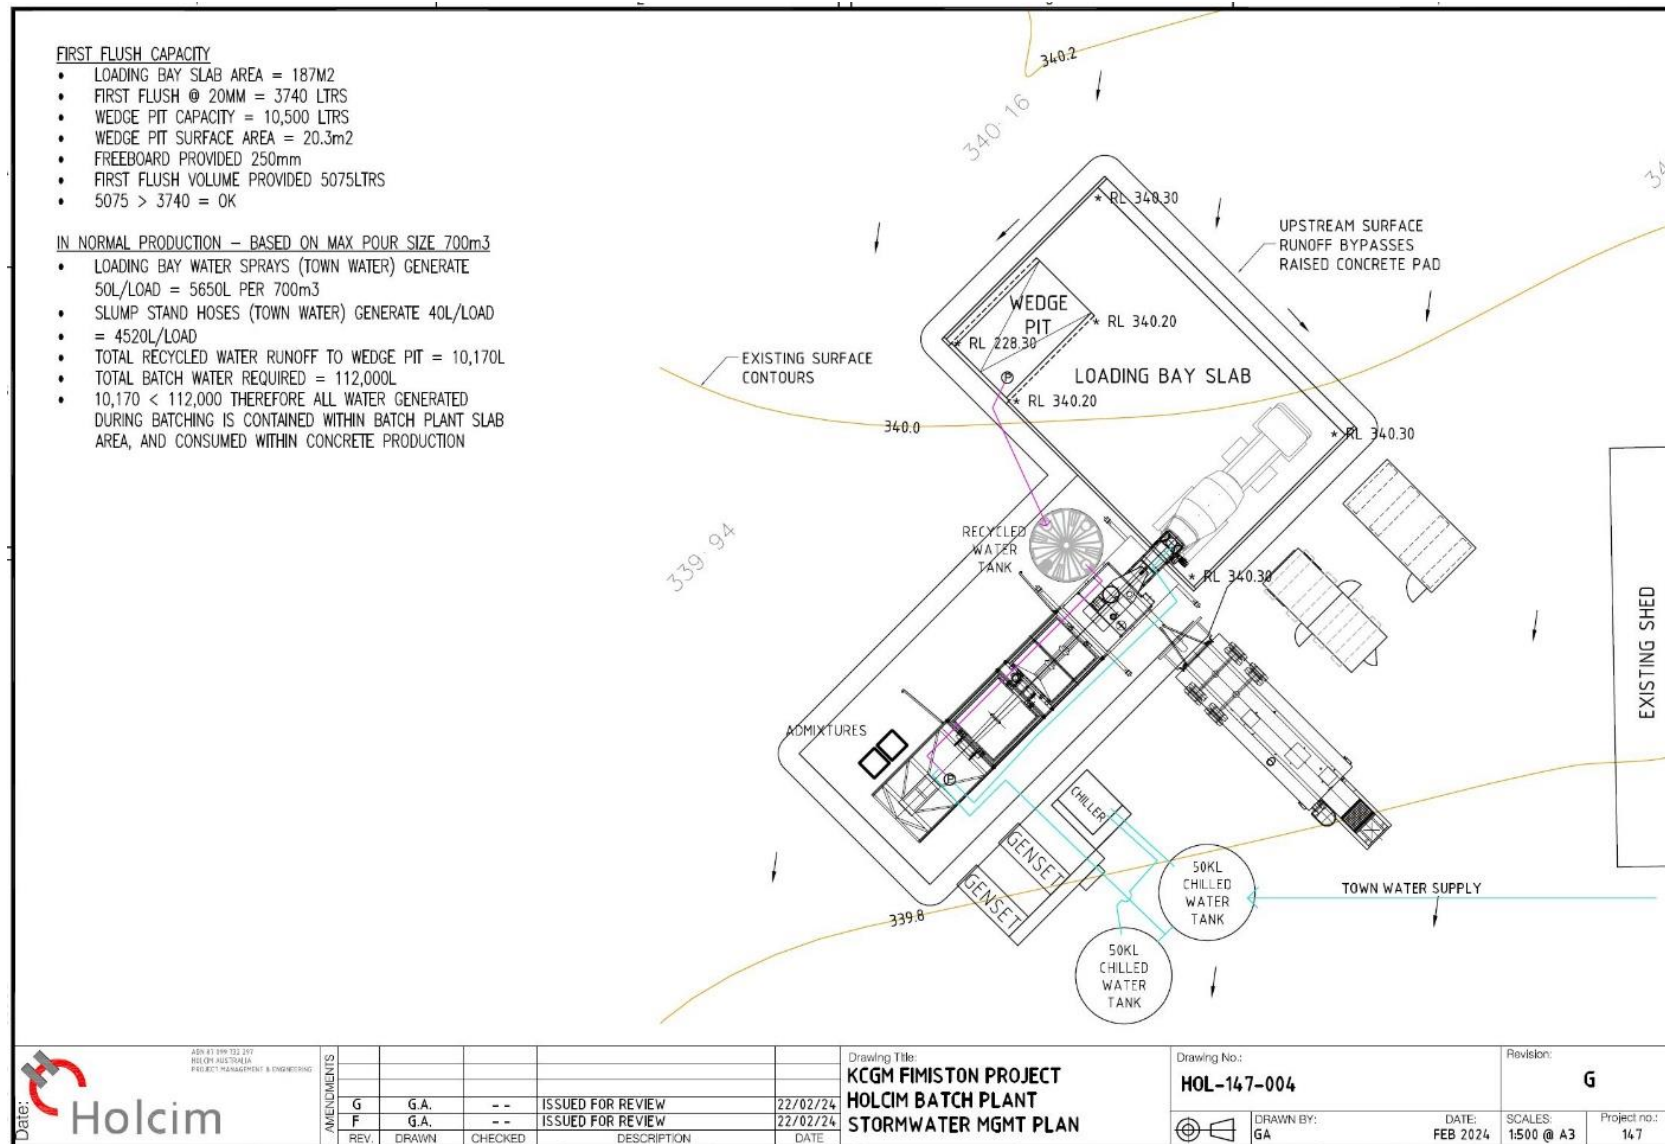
Layout of the concrete batch plant stormwater management infrastructure
